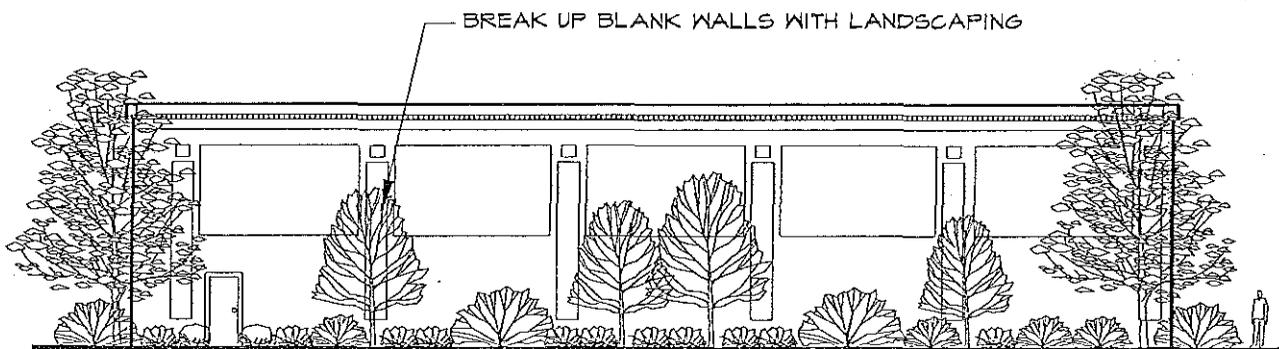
TYPICAL BLANK END WALLS LANDSCAPED
